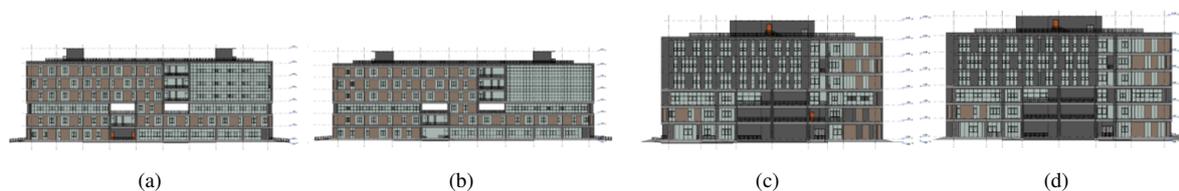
The facade of the teaching building: (a) North elevation; (b) South elevation; (c) East elevation view; (d) West elevation view
